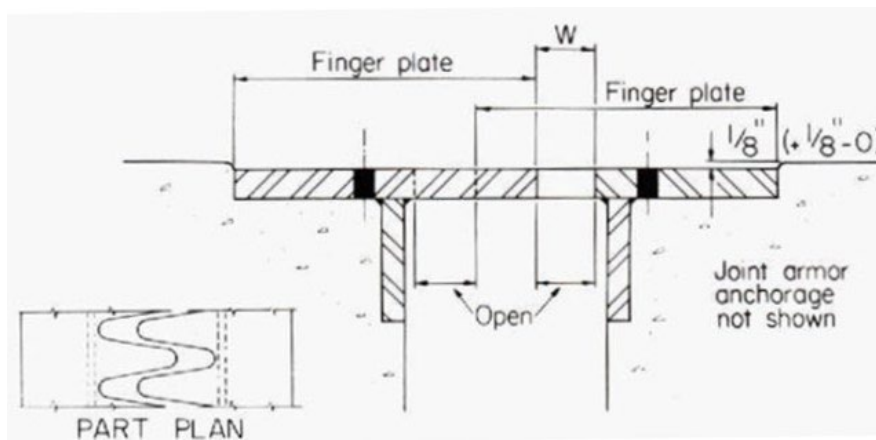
Cross Section of a Cantilever Finger Plate Joint
